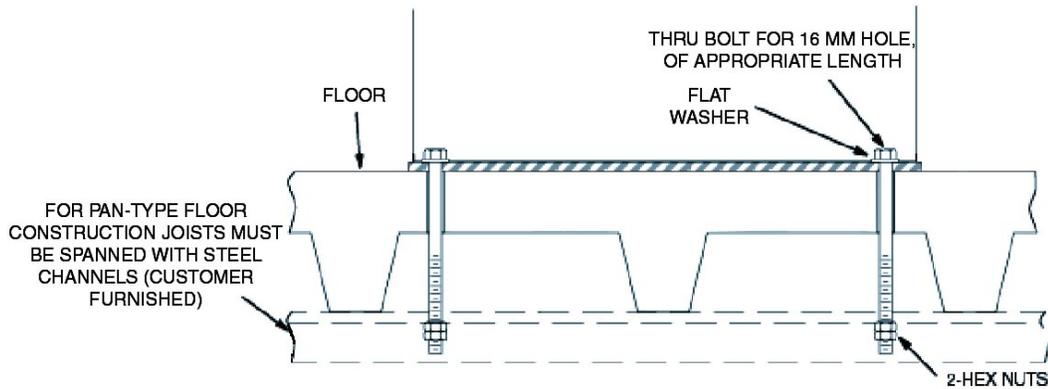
Thru-Bolt Floor Mounting (Pan-Type Floor Construction)
